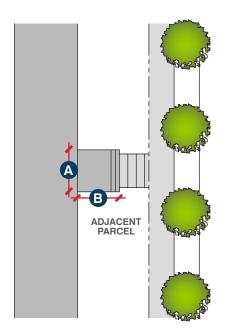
FIGURE: DOORYARD FRONTAGE PLAN VIEW DIAGRAM
